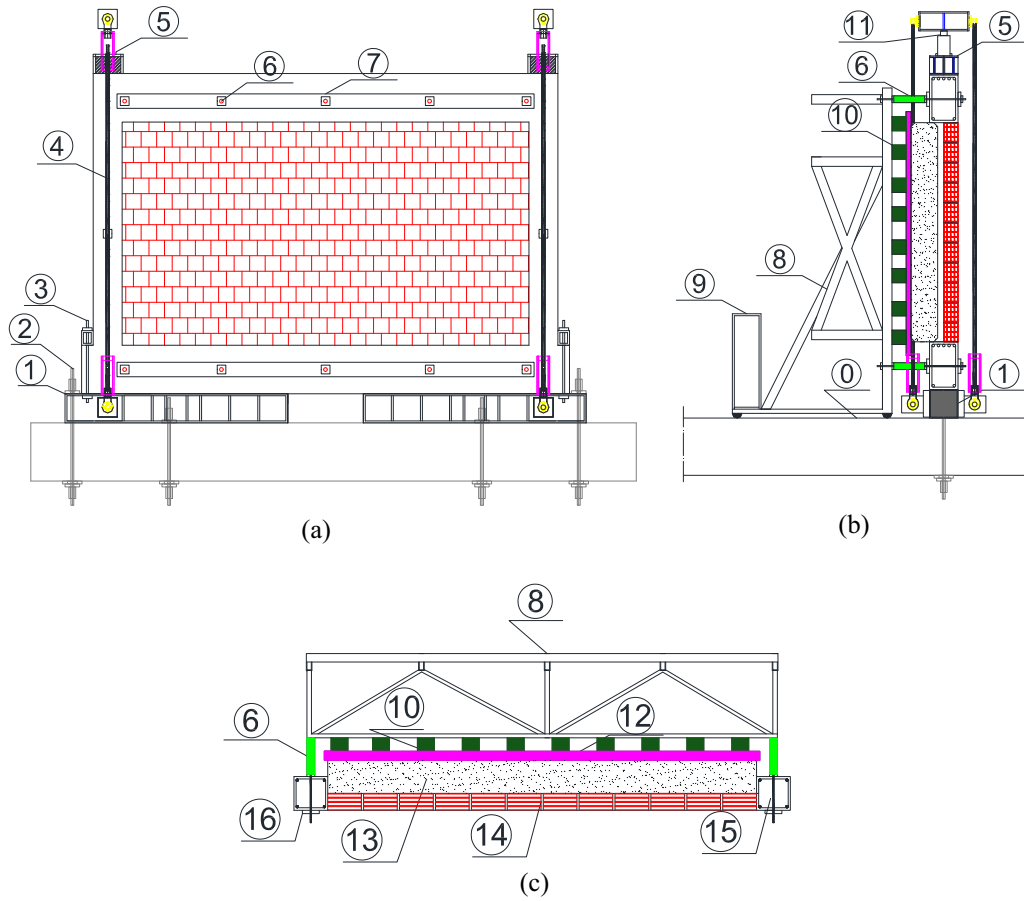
Layout of the out-of-plane test set-up: (a) front, (b) lateral and (c) plan view. 0 – strong floor, 1 – foundation steel shape, 2 – high-strength rods ($\varnothing 30$ mm) fixing the foundation steel shape to the reaction slab, 3 – steel rod ($\varnothing 20$ mm) connecting the RC frame to the foundation steel shape, 4 – vertical high-strength rods ($\varnothing 30$ mm) to apply axial load, 5 – steel cap, 6 – steel rods ($\varnothing 20$ mm) connecting the RC frame and the reaction structure, 7 – distributing load plate, 8 – self-equilibrated reaction steel structure, 9 – counterweight, 10 – wood bars, 11 – hydraulic jack (for axial load application), 12 – vertical wooden platform, 13 – airbags, 14 – infill panel, 15 – RC column, 16 – steel plate for rod force distribution.
